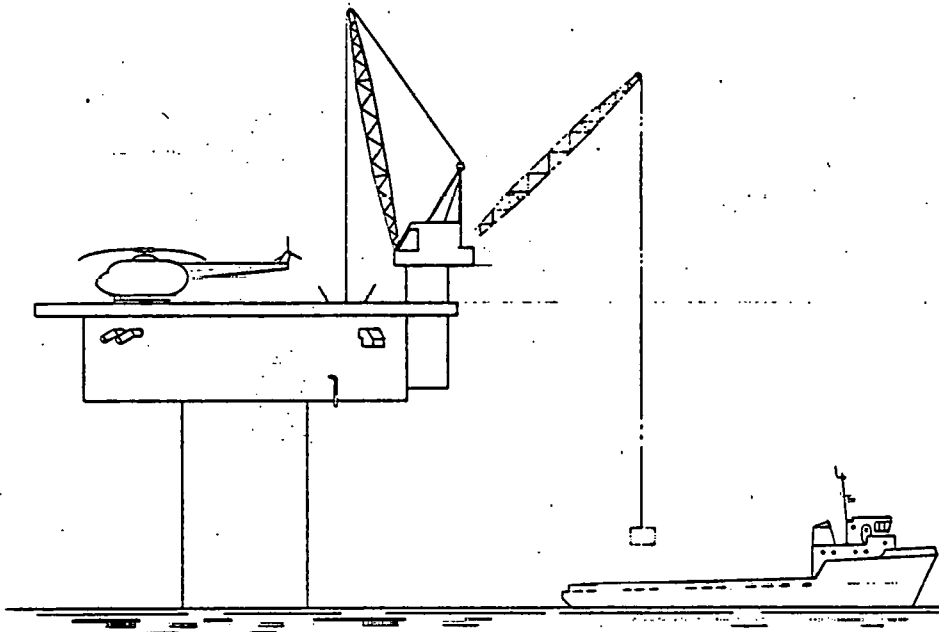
Handling Equipment Arrangement, 400-MW(e) Spar, Helideck Crane
